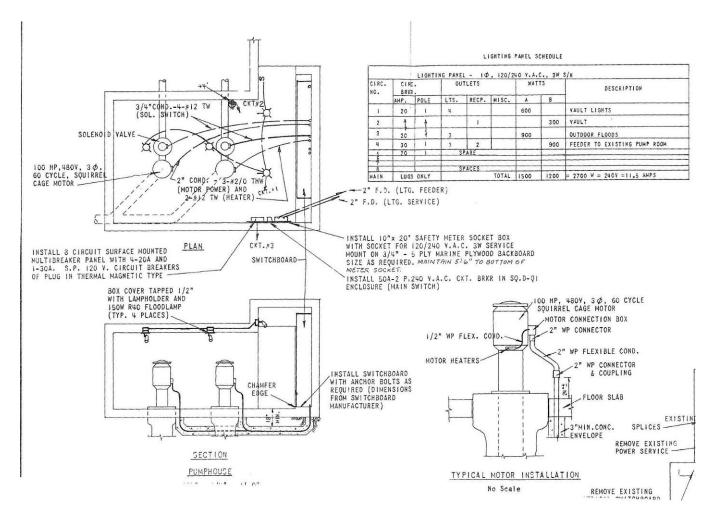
Concrete Pump house plan section and detail, dated 1961. Courtesy of City of San Diego Real Estate Management Department.
